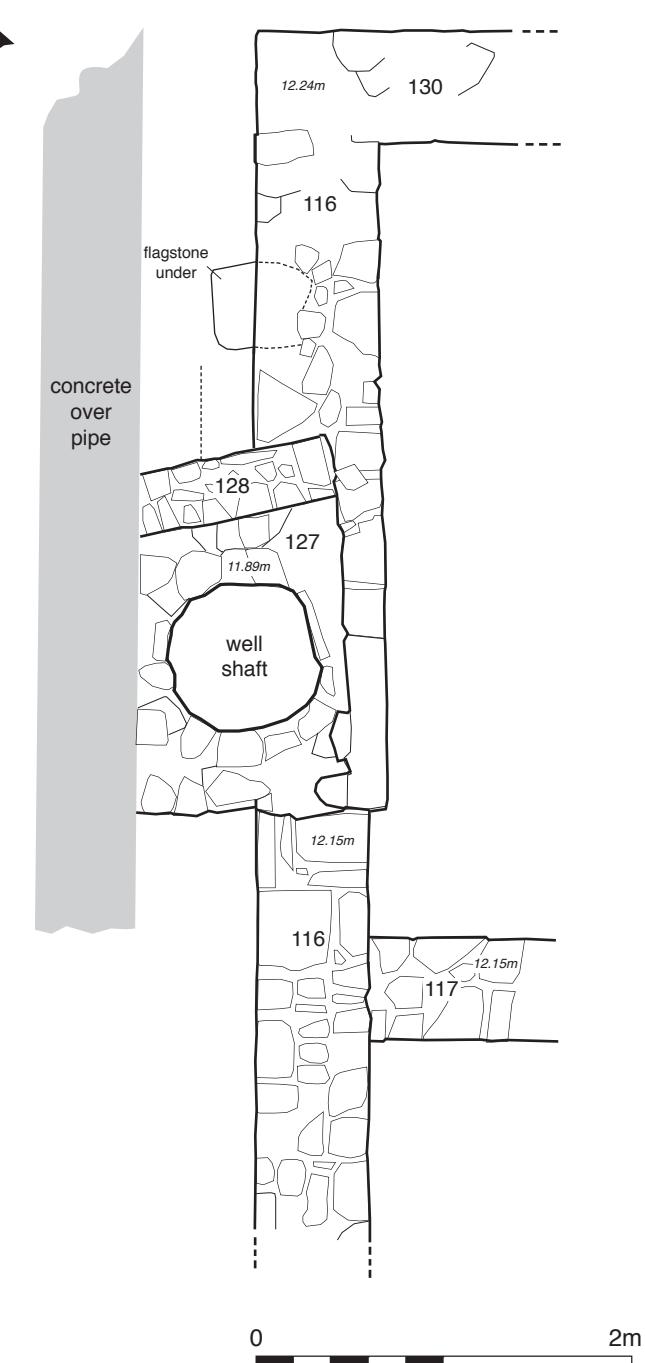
Plan drawing (original scale 1:20) showing part of north-west exterior wall (116) of the 'New Swan' inn and 18th century well (127) and rear wall (128) belonging to the earlier public house, scale 1:40
